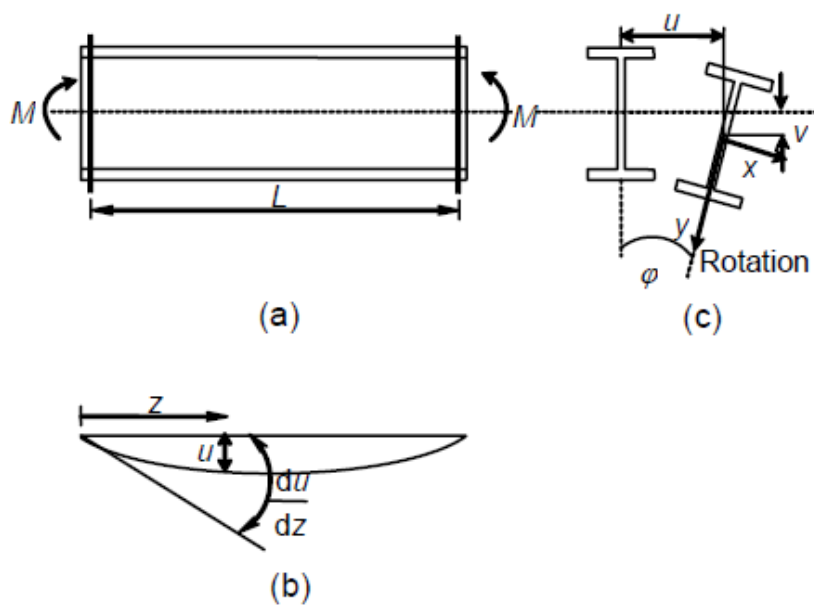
Lateral torsional buckling of a simply supported I-section. a) Elevation, b) Plan on the longitudinal axis, c) Section [8]
